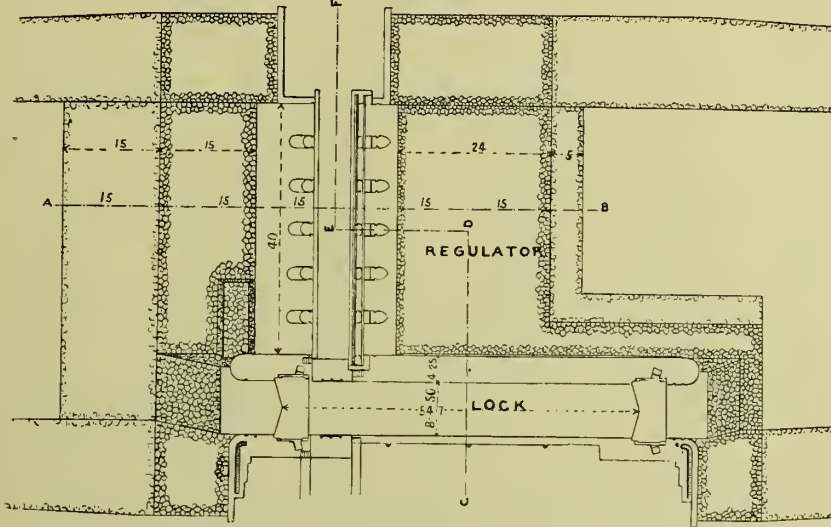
Tewfiki Canal Head. Plan. Approx. Scale $\frac{1}{125}$.
